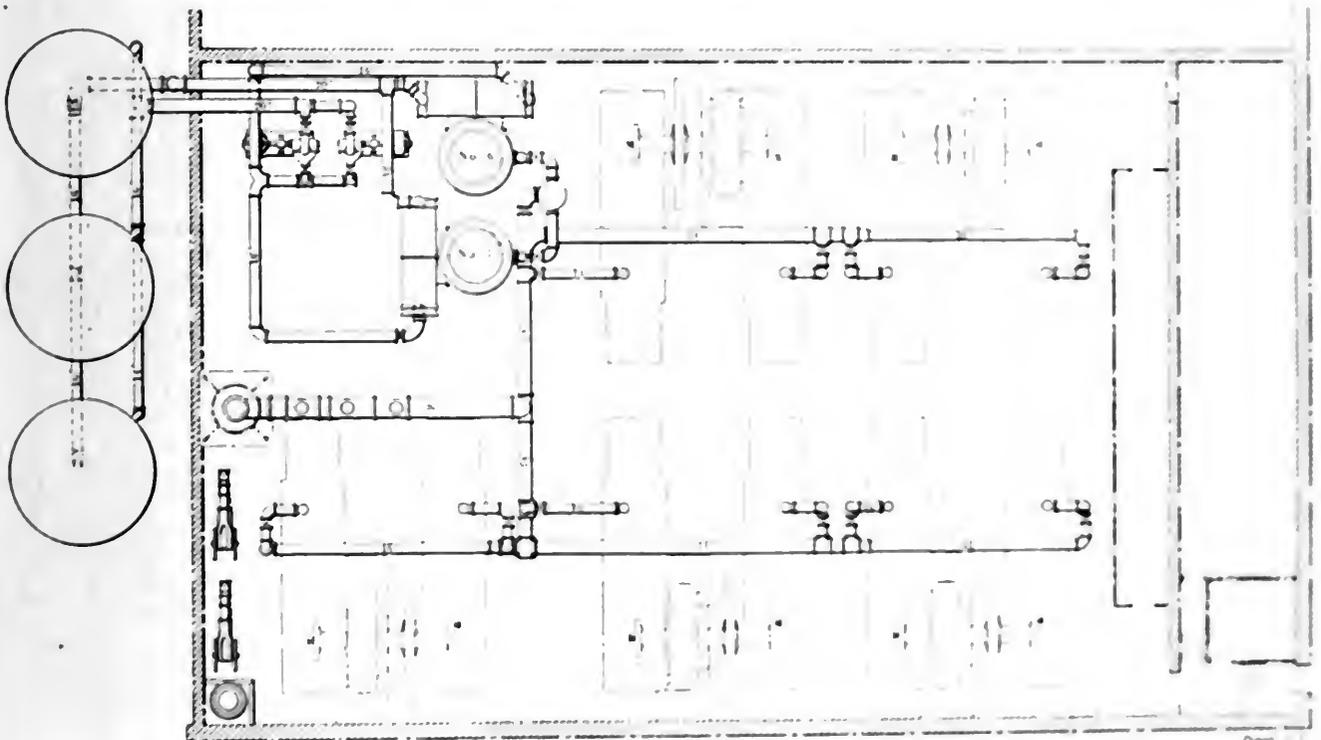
A PLAN OF EXHAUST PIPING IN STATION
